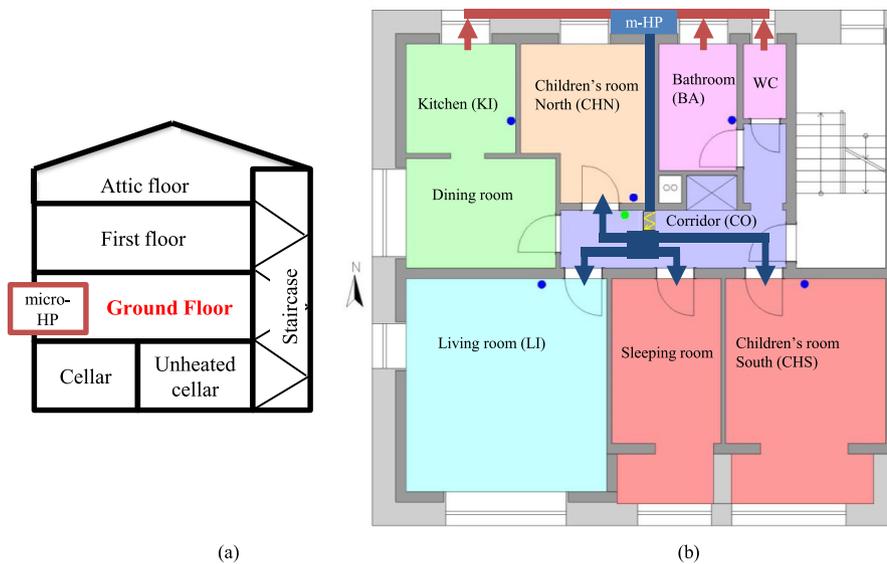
Simplified scheme of the demonstration building (a) and floor plan of the flat on the ground floor with a simplified scheme of ducting for ventilation and heat distribution (b) [23].
